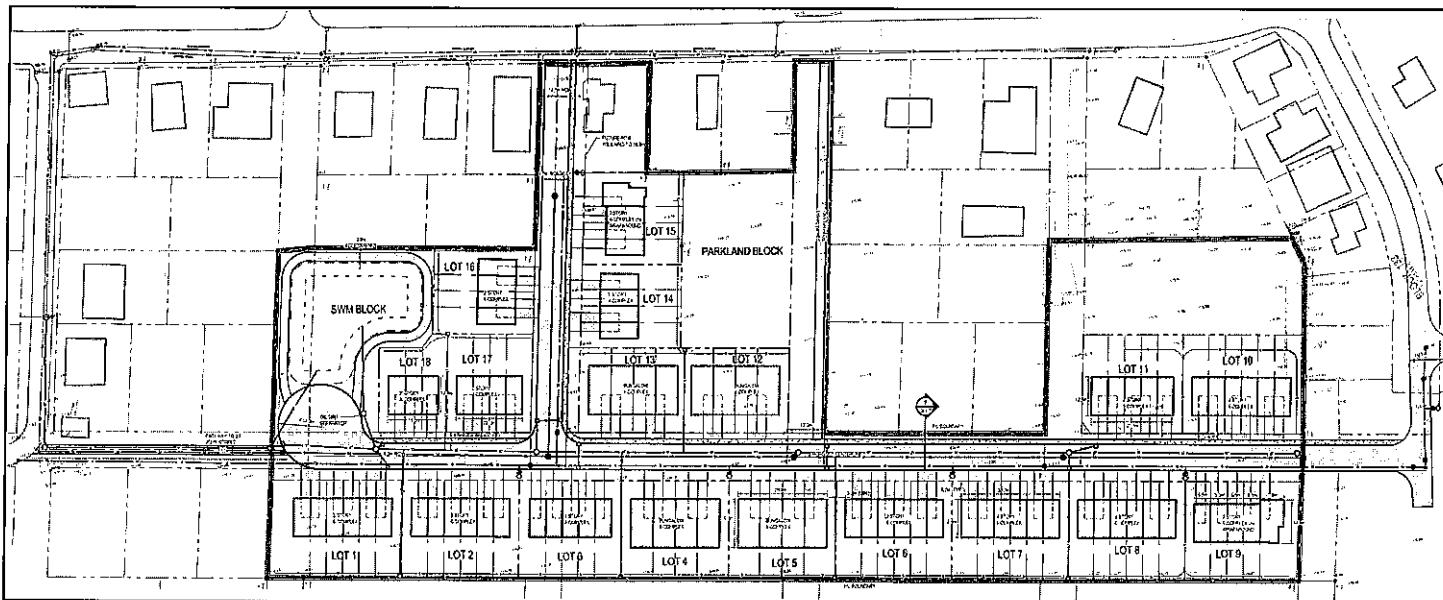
Exhibit B: Concept Site Plan of the Merrickville Grove Subdivision.
